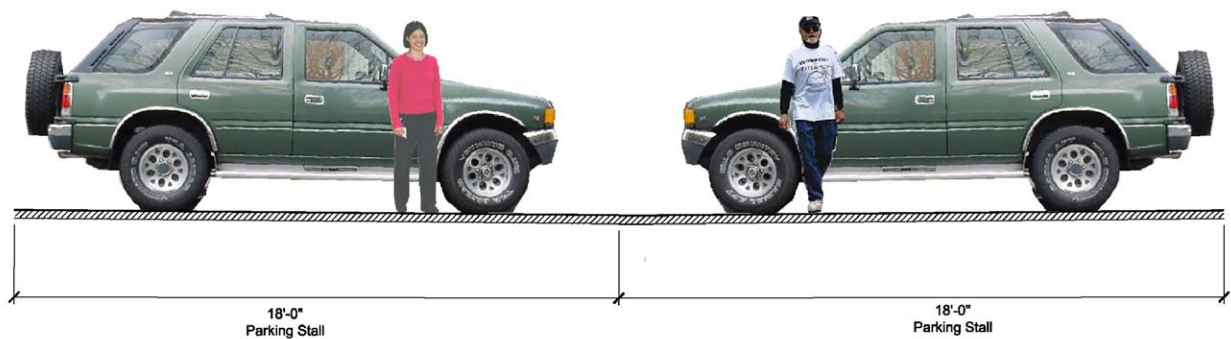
This typical cross section illustrates a conventional parking lot condition with 18 feet long parking stalls.
